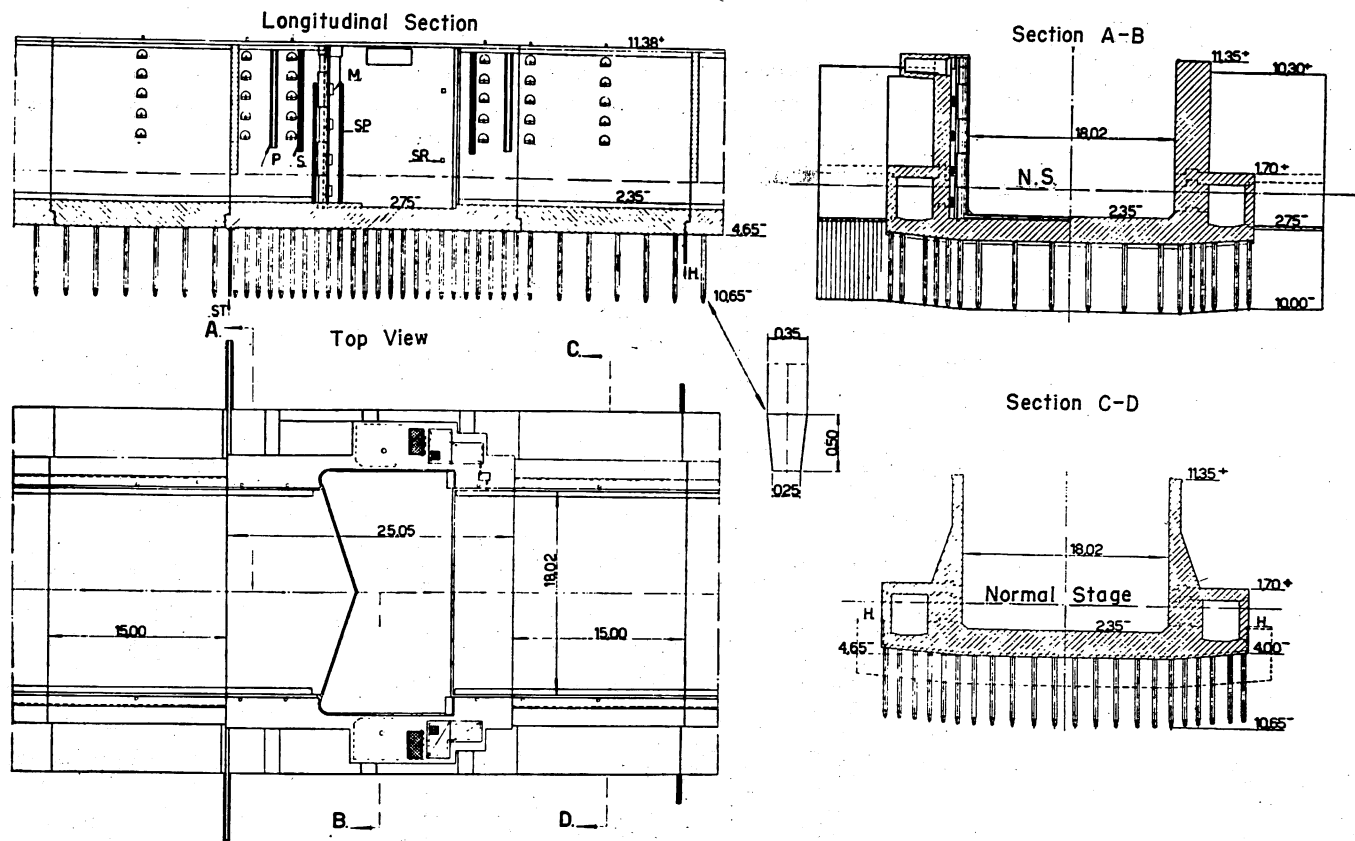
Layout of an Intermediate Lockhead and Adjacent Chamber Sections
